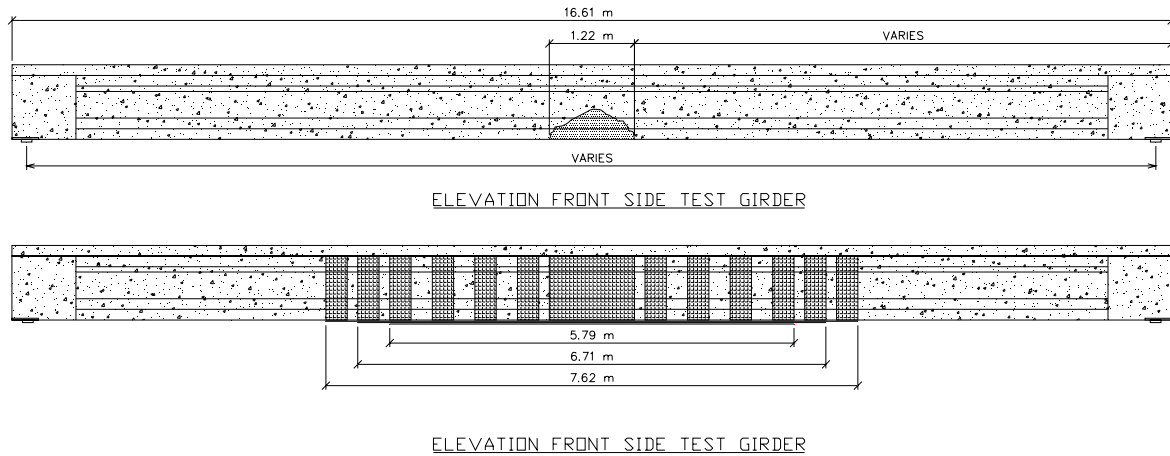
AASHTO2 and AASHTO3 girders' damaged and repaired elevations.
